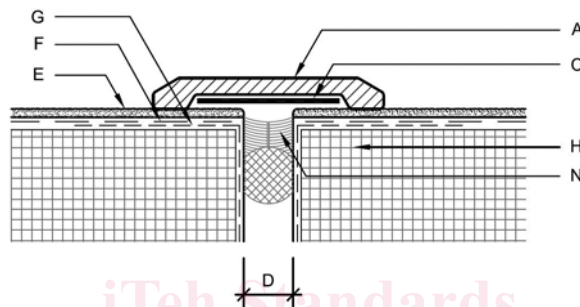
Sealant Bridge Joint Seal Using Liquid—Applied Sealant and Bond Breaker
